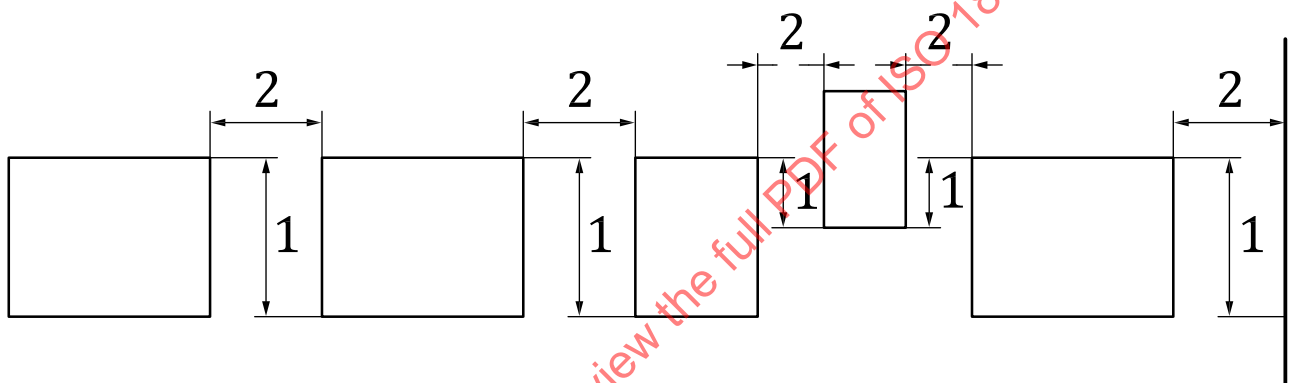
Minimum cross-section dimensions for rectangular structural concrete walls
